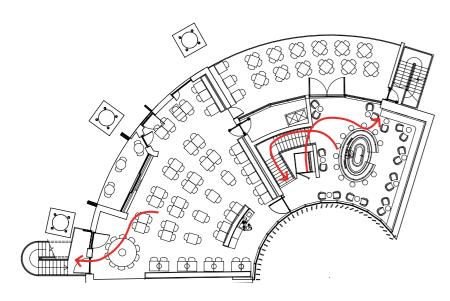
Fire escape routes at first floor (Scale 1:300 @ A3)
